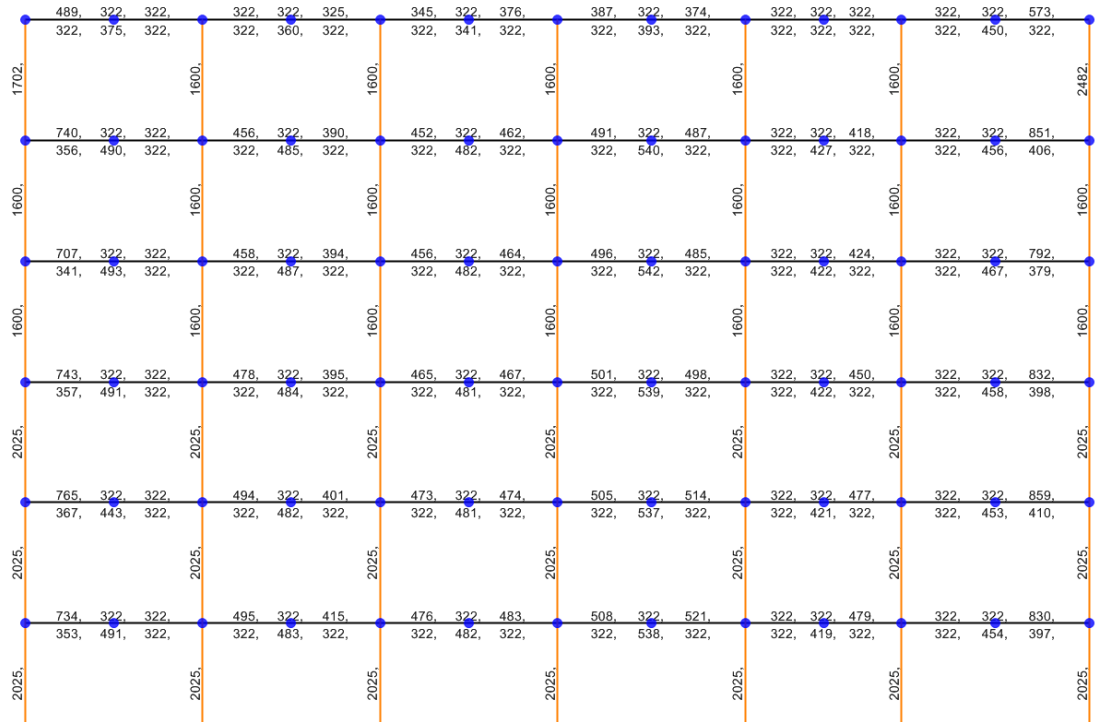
Zoomed reinforcement details (all values in mm<sup>2</sup>)
